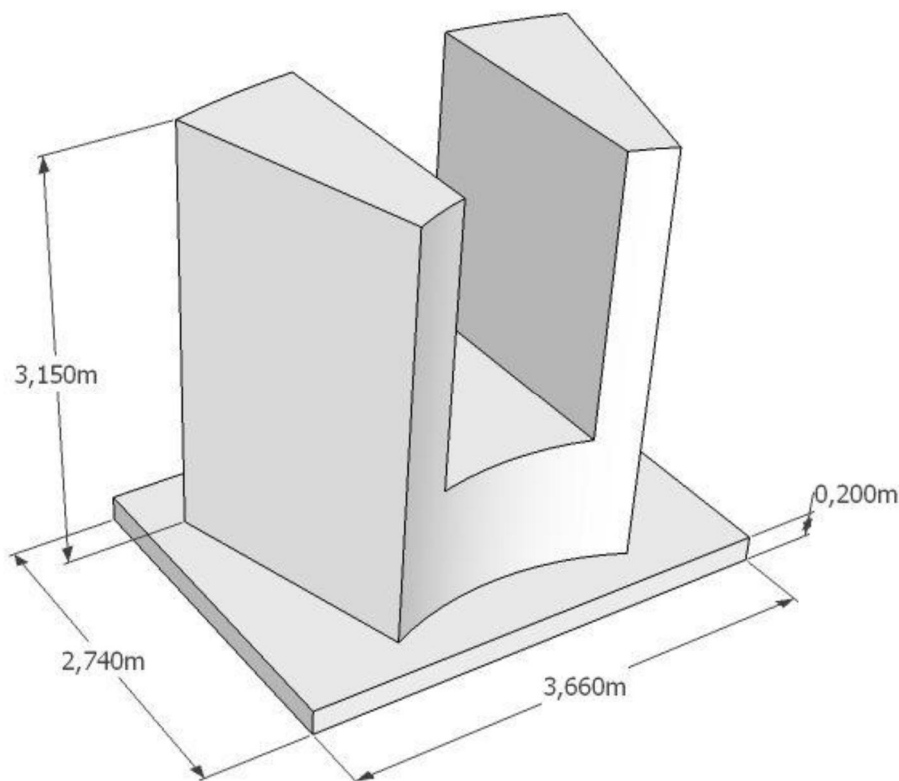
Schematic overview of the TVO -thick-walled concrete structure
